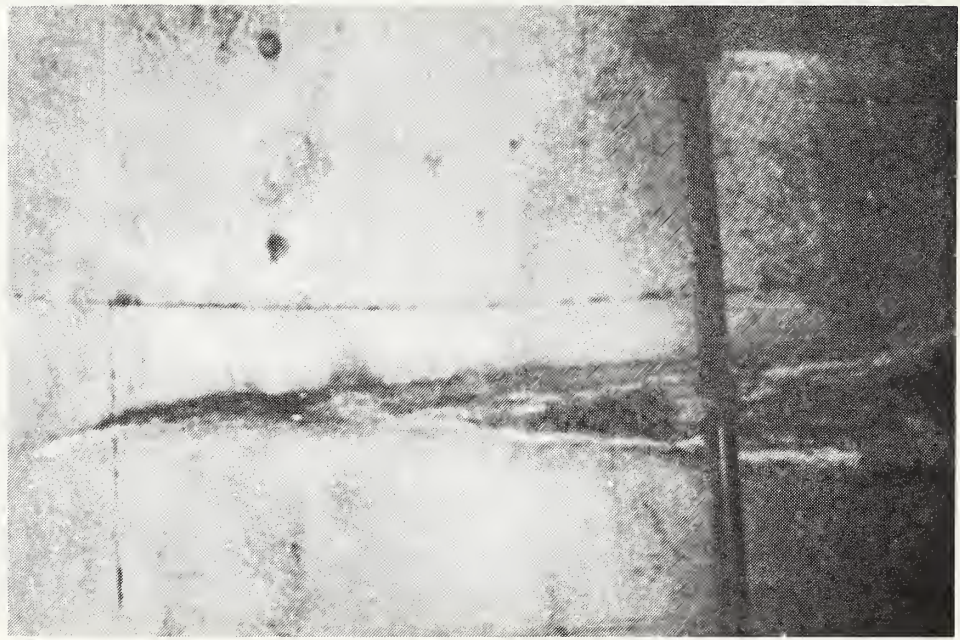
LEAKS THROUGH THE SHRINKAGE CRACKS IN CONCRETE LINING
